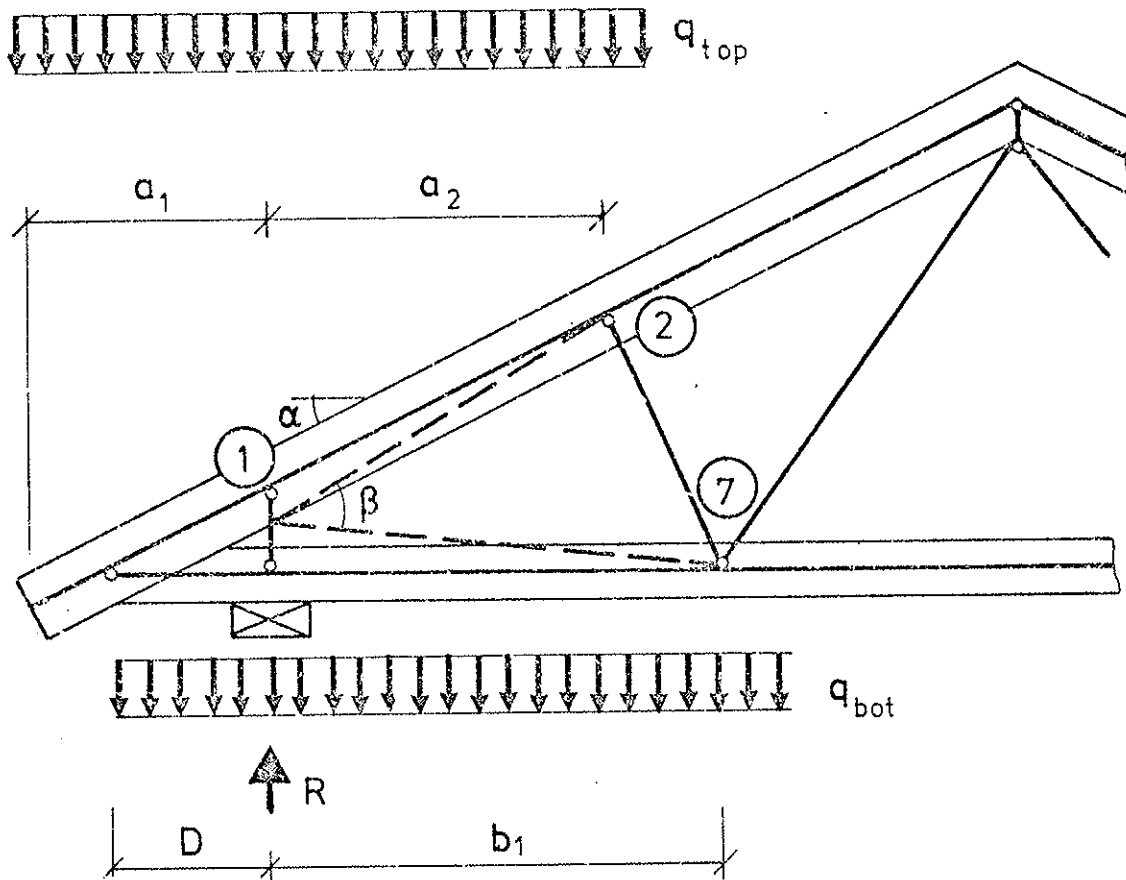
Cantilevered truss. Geometry and design modification of the truss.
